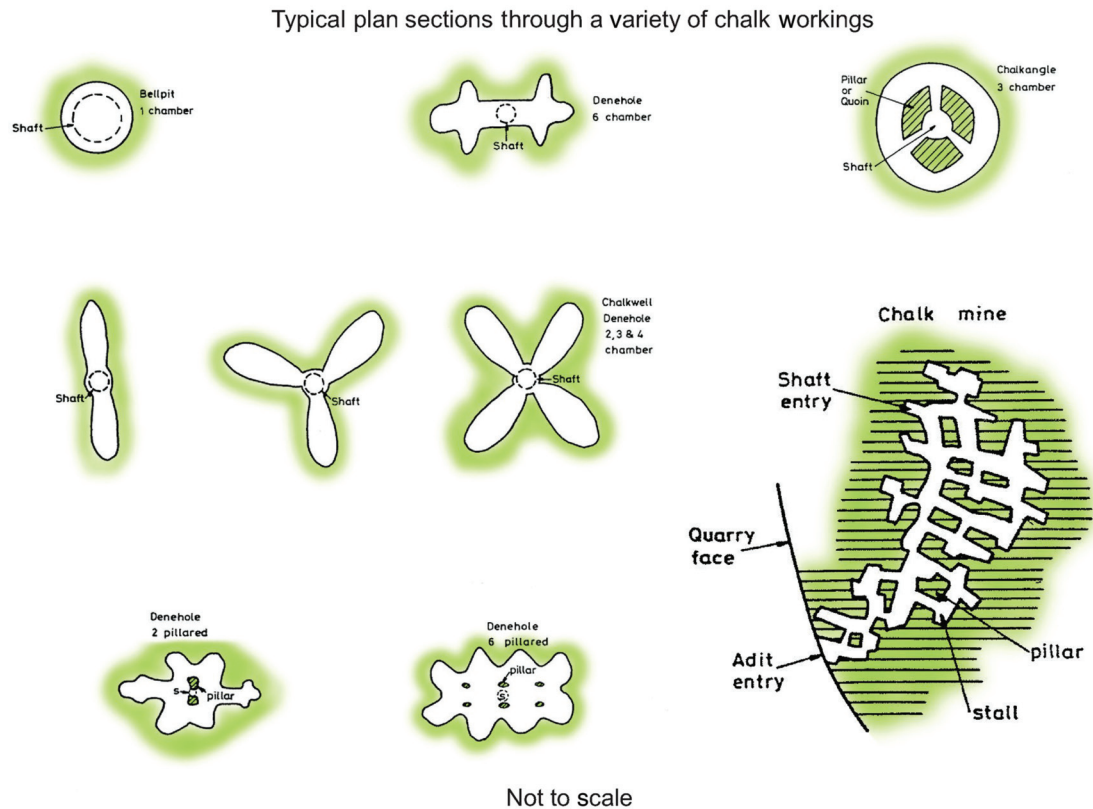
Typical schematic plan sections through a variety of chalk mine workings (Edmonds 2020b).
